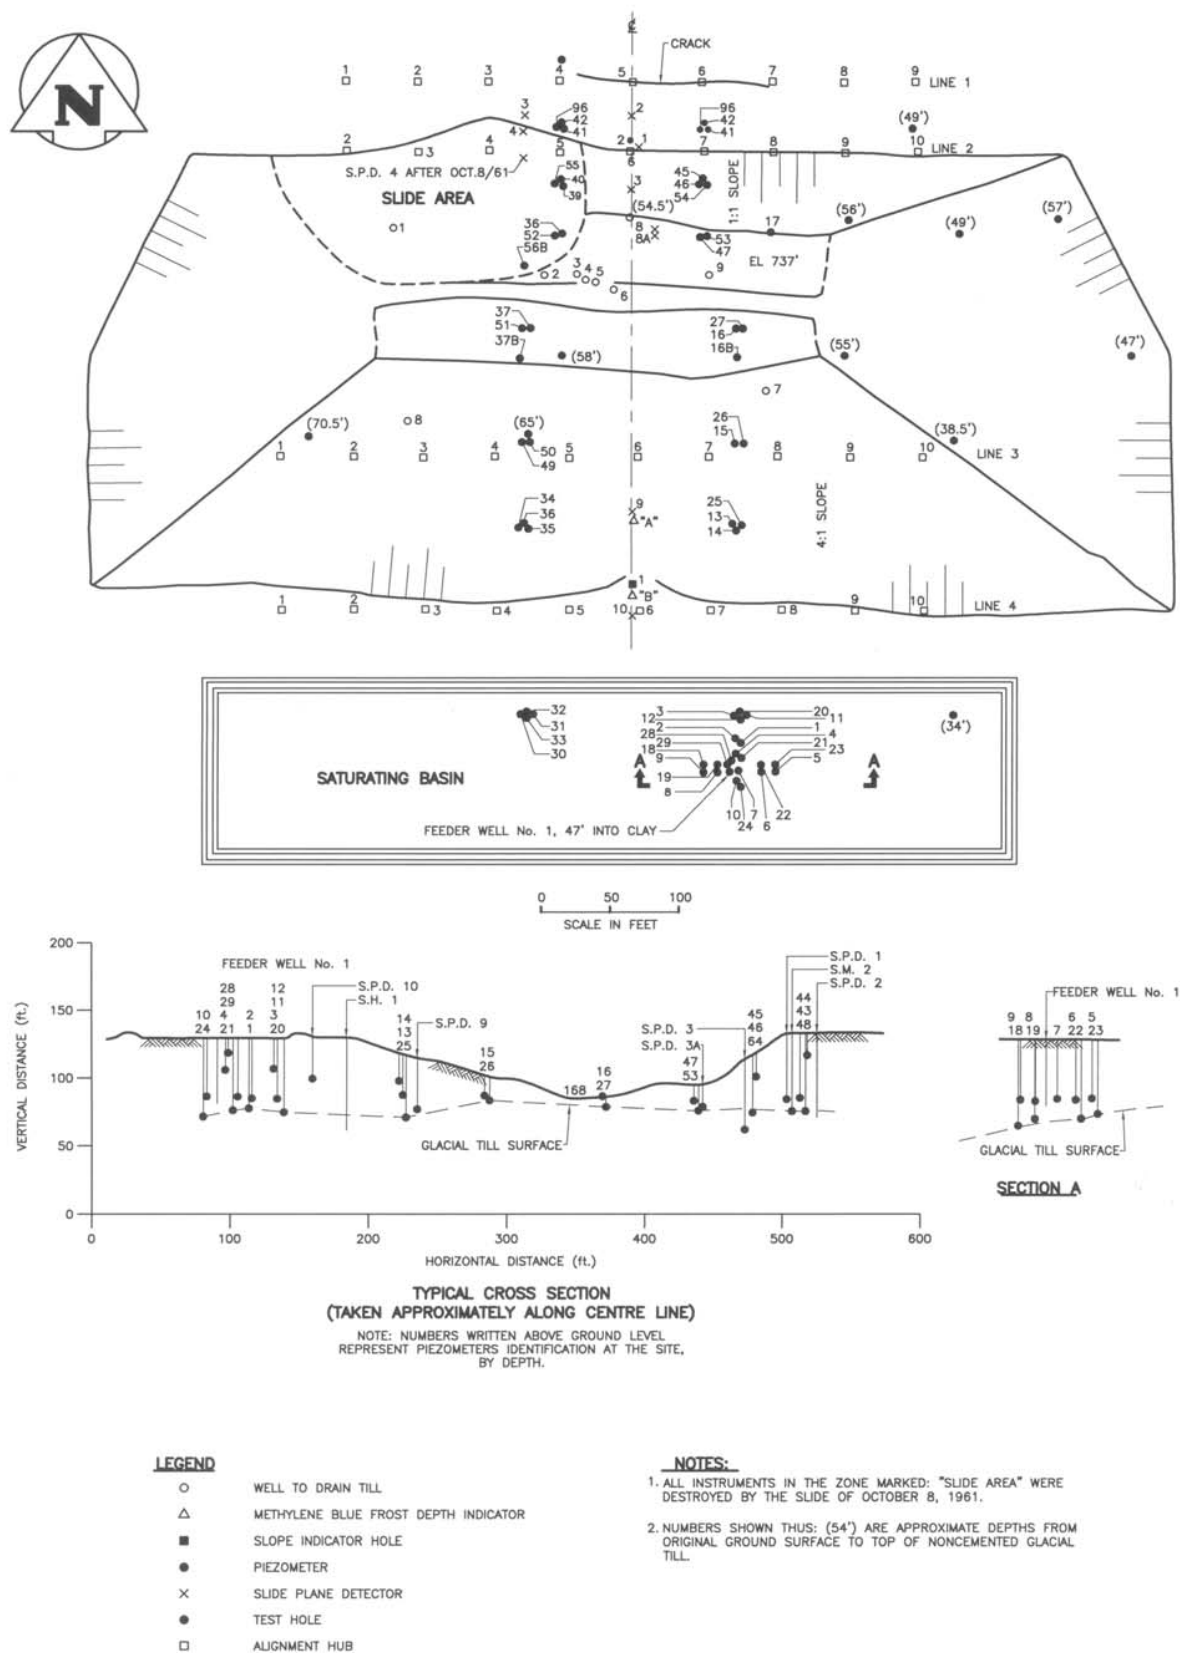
Test pit excavation plan and cross-section showing instrumentation.
